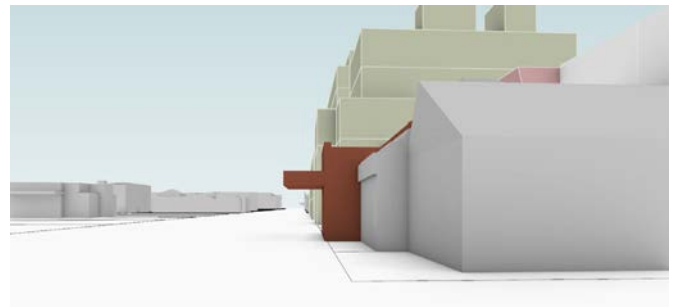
VIEW 4 - Looking west from the northern footpath on Swan Street at the intersection of Queen Street and Swan Street.
